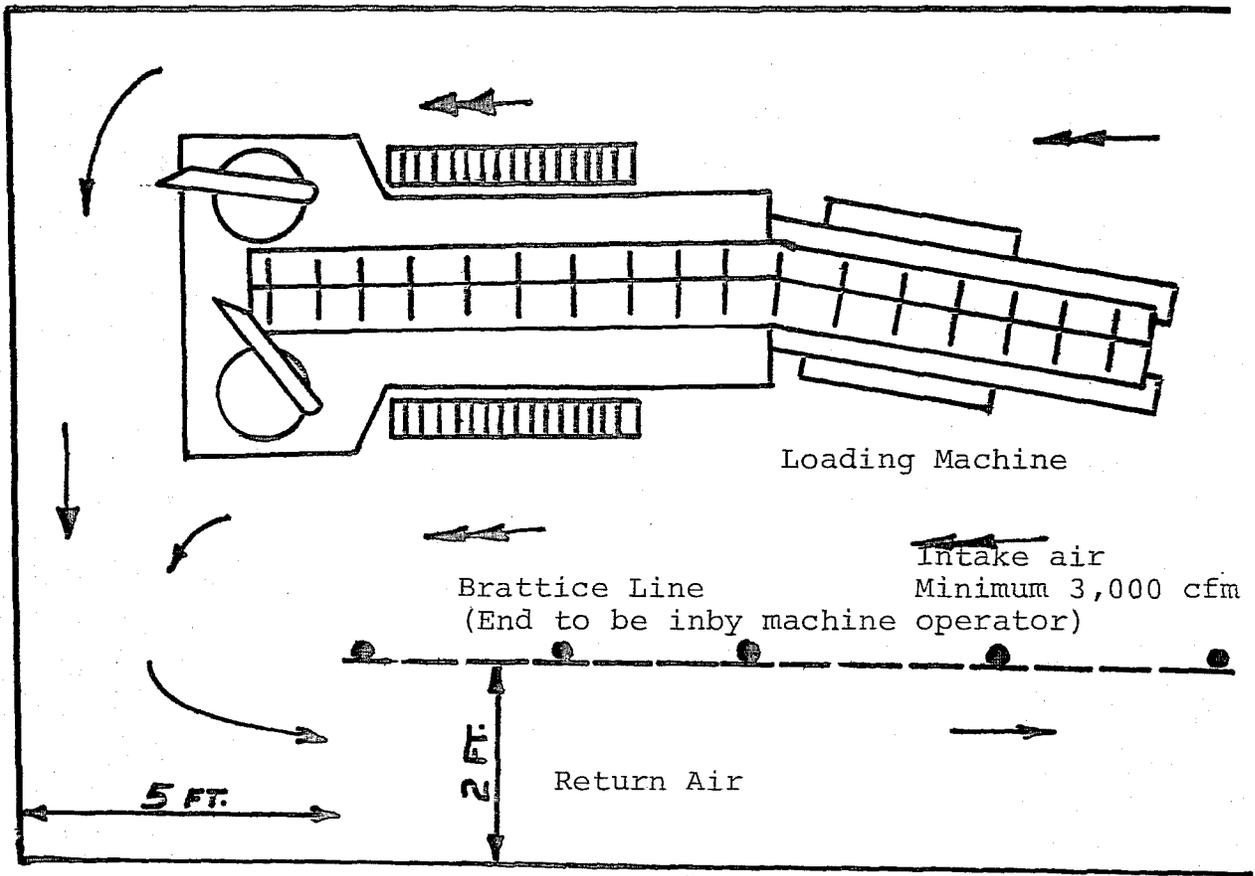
Exhausting Face Ventilation System for Loading Machine
